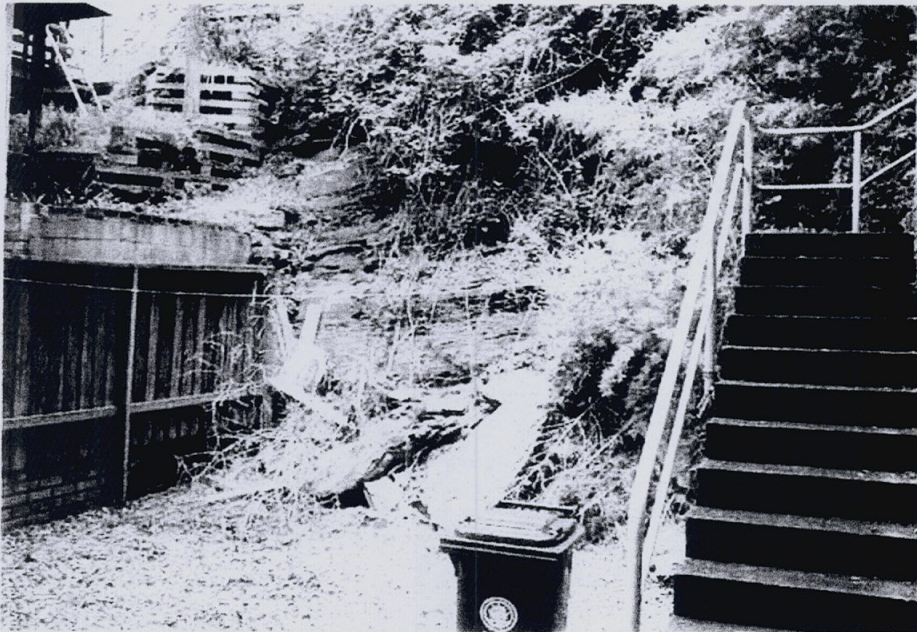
Shaly sandstone /sandy siltstone outcrop between 1096 and 1098 Barrenjoey Road.
